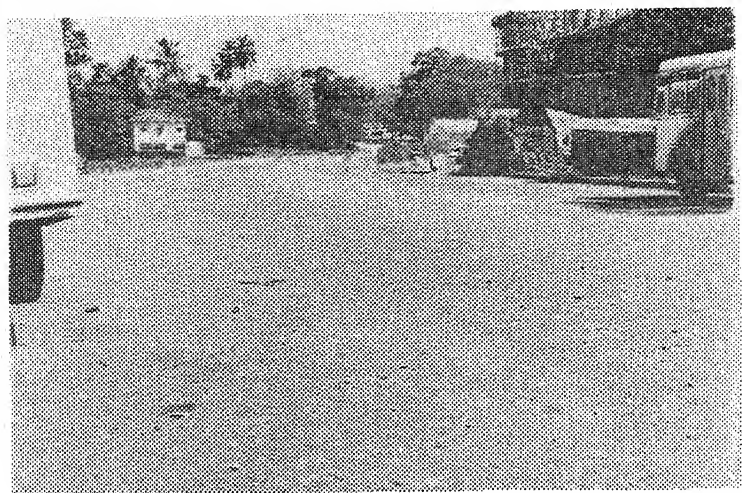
Showing Newly Constructed Shornur Bye-pass
